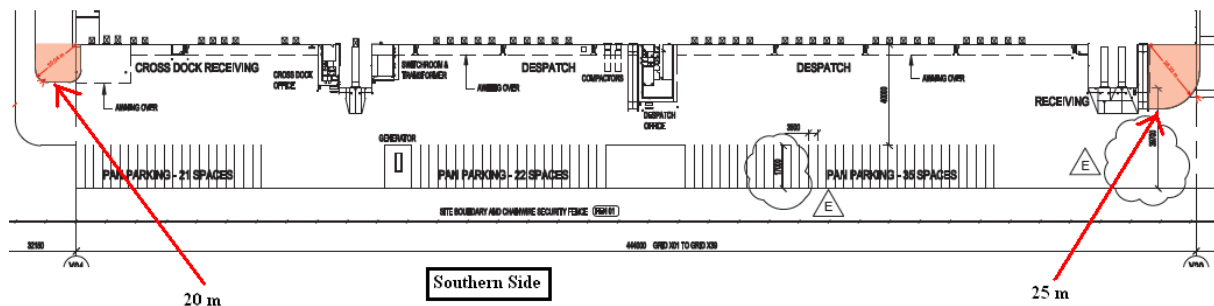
Site plan showing perimeter fire brigade vehicle access for the facility.
